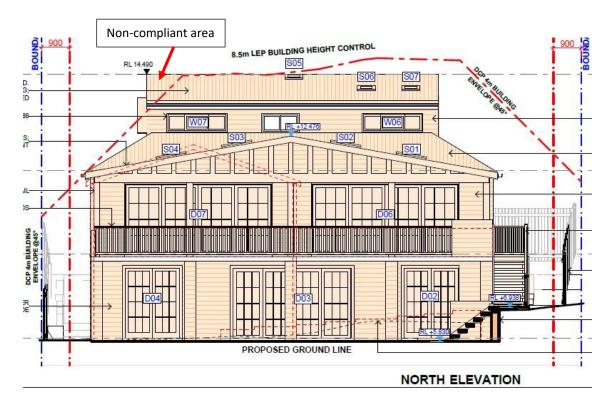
Excerpt from North Elevation, Drawing DA11, showing the non-compliant area
